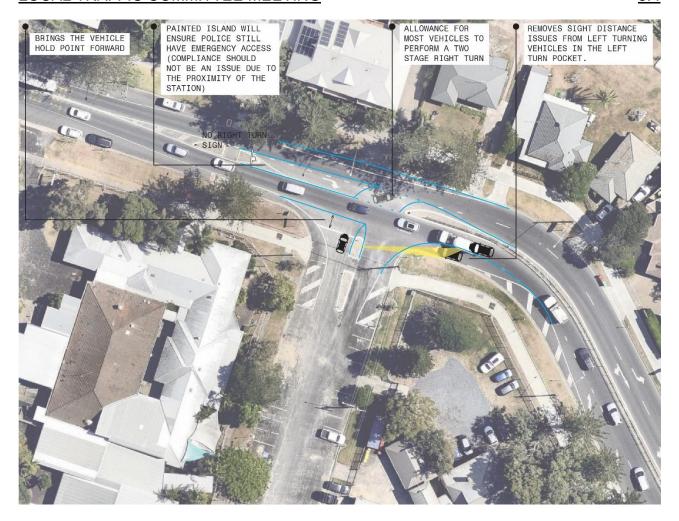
Design intent: Intersection of Shirley Street at Wordsworth Street
